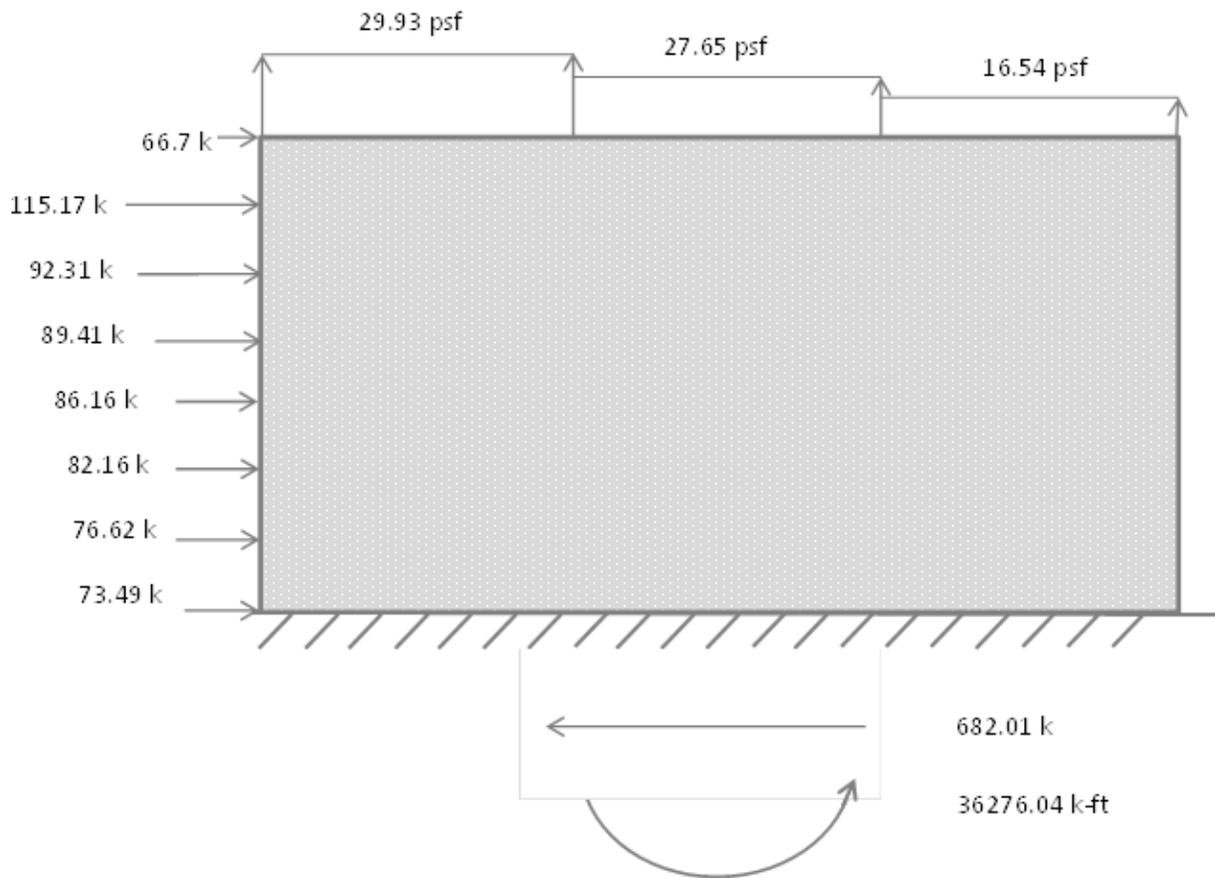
List and diagram showing the wind forces on the building in the N-S direction
